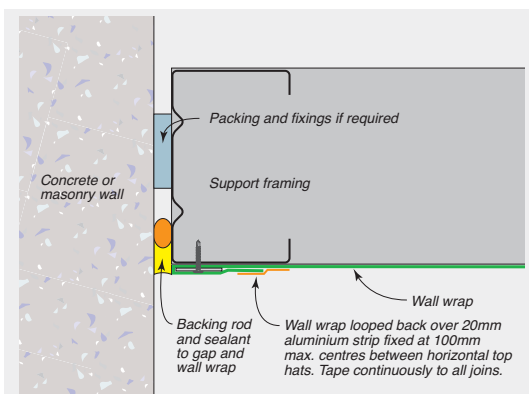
Abutment to Concrete or Masonry Wall
